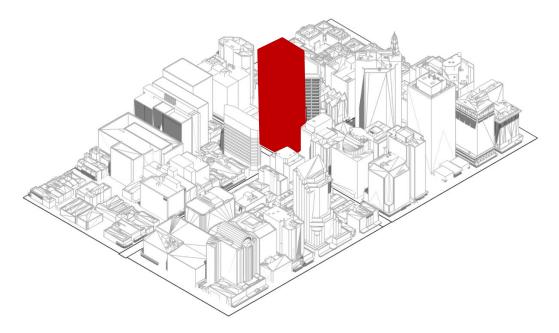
Isometric image showing location of proposed building (Image courtesy of GHD WOODHEAD)
